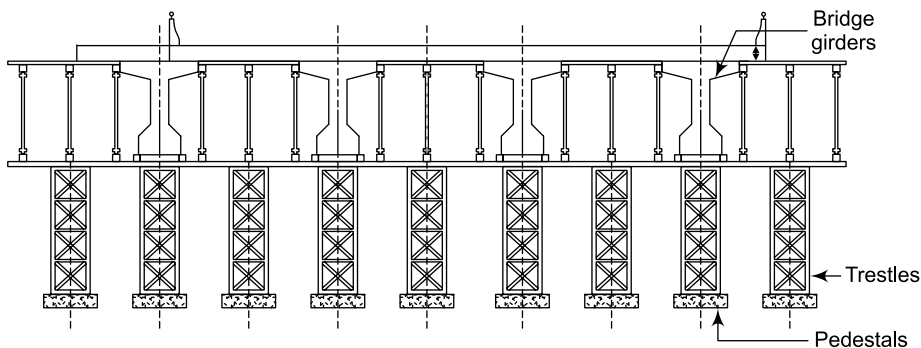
Another Arrangement of Trestles to Support Bridge Girders and Deck Slab.
